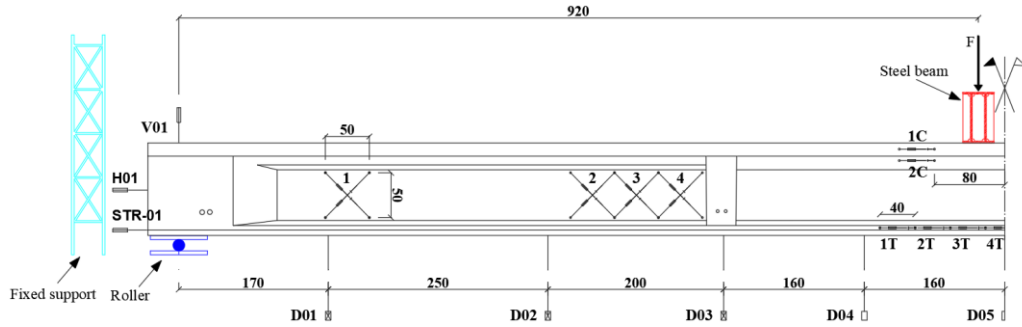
Test setup and layout of the monitoring system installed on B4-P47/46 girder (unit: cm).
